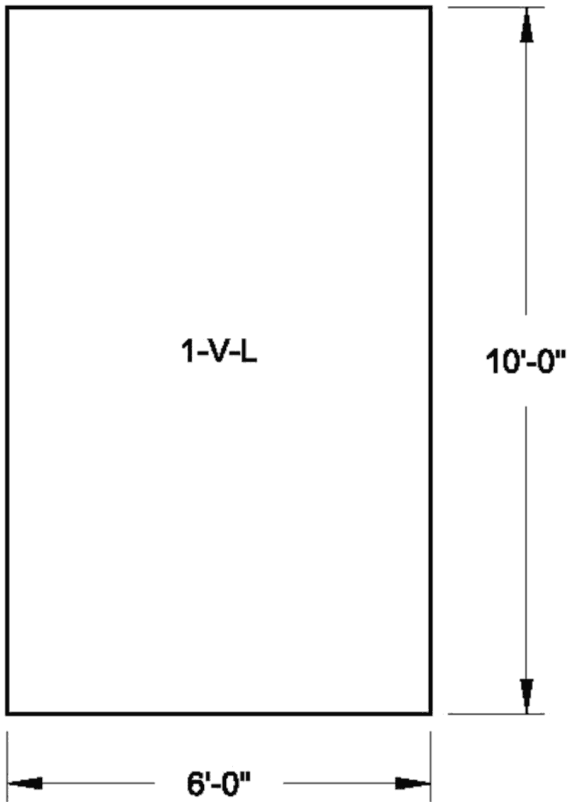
H.6-160 DGFOV Roof 6 Looking Down
